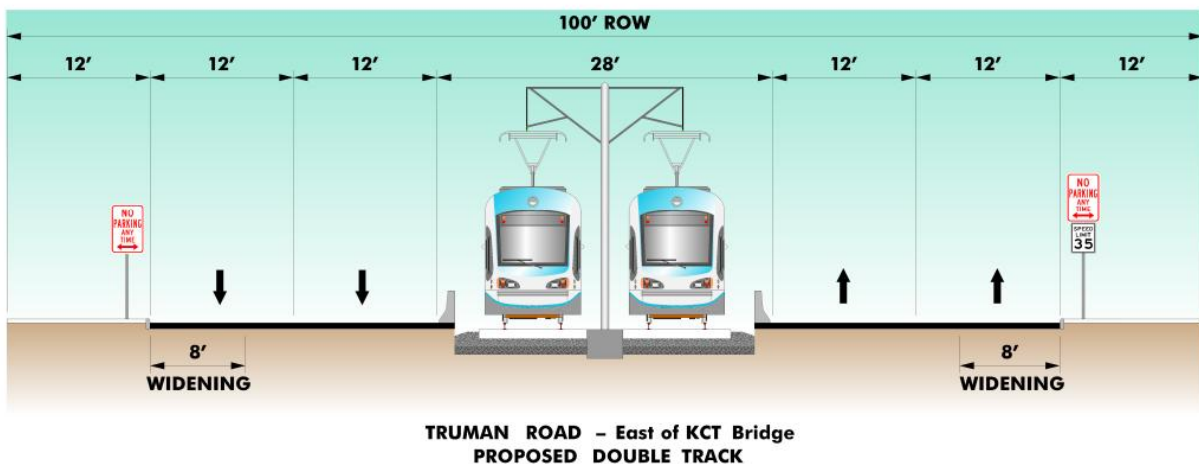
Enhanced Streetcar Typical Section - Truman Road, East of KCT Bridge
